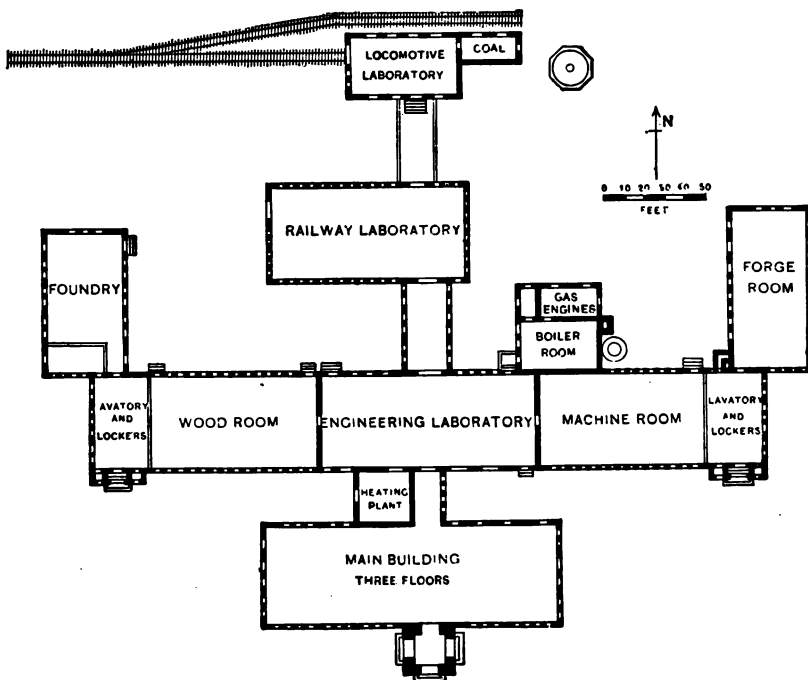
A Plan of the Reconstructed Engineering Laboratory, Purdue University, 1898.
